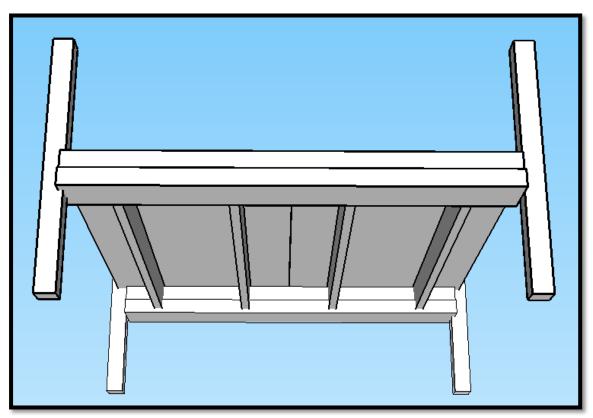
Bottom of Alternative Prestressed Concrete Bay Design
